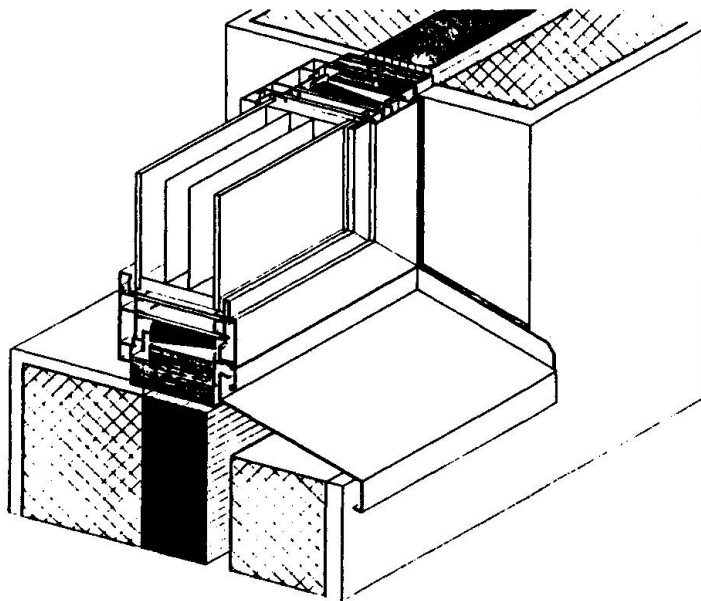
(left) Example for curtain wall with HIT-windows, casements.
